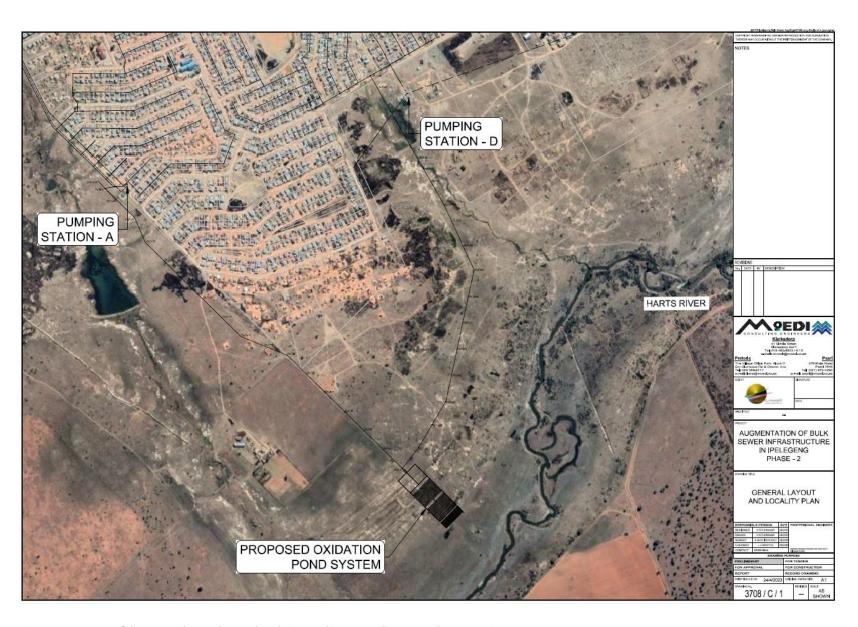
Layout Map of the proposed Sewer lines and Oxidation Pond System, Ipelegeng, North West Province
